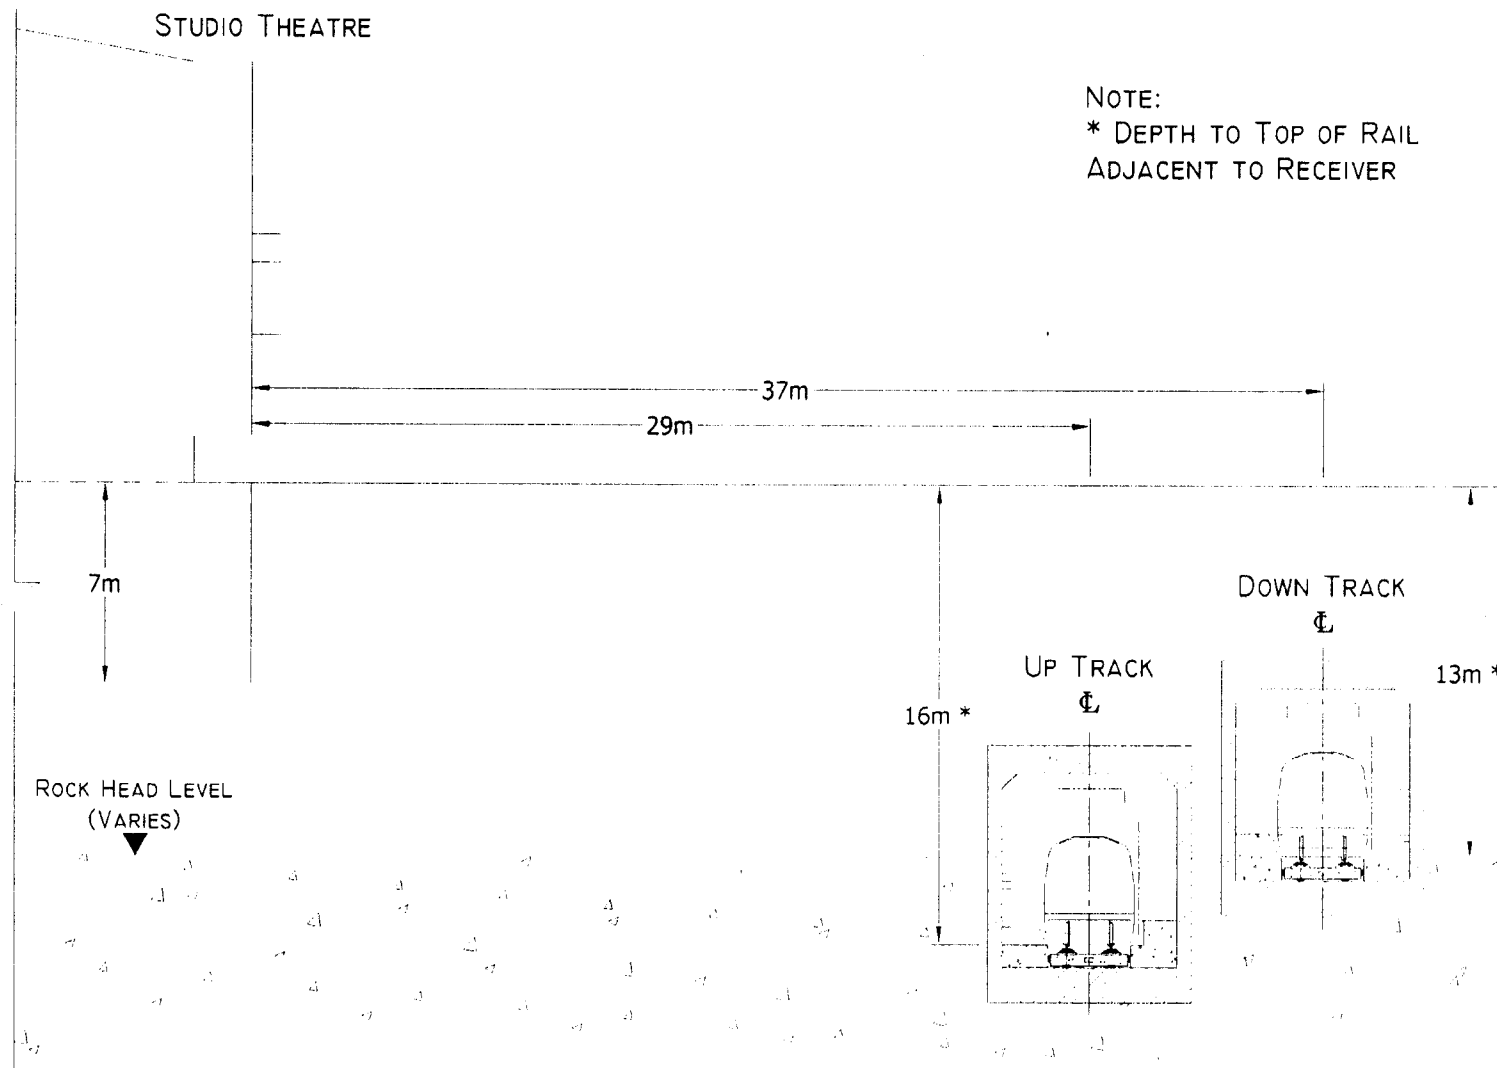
C SCHEMATIC SECTION OF THE TUNNEL ALIGNMENT ADJACENT TO HKCC STUDIO THEATRE
